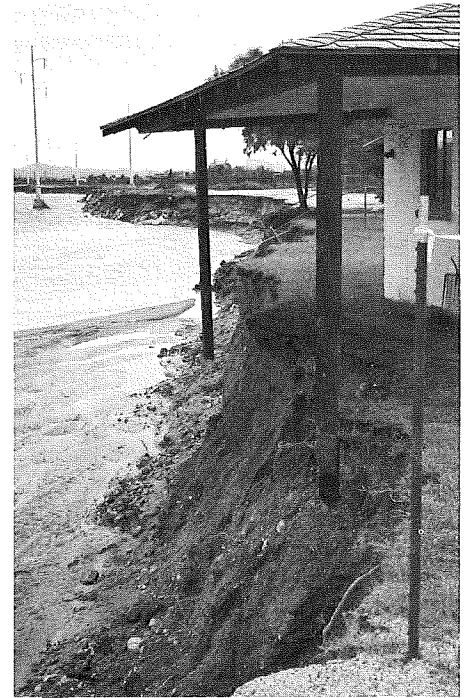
Bank-cutting along north bank of Rillito Creek at N. 1st Avenue. Looking downstream. Photo by Peter Kresan.
